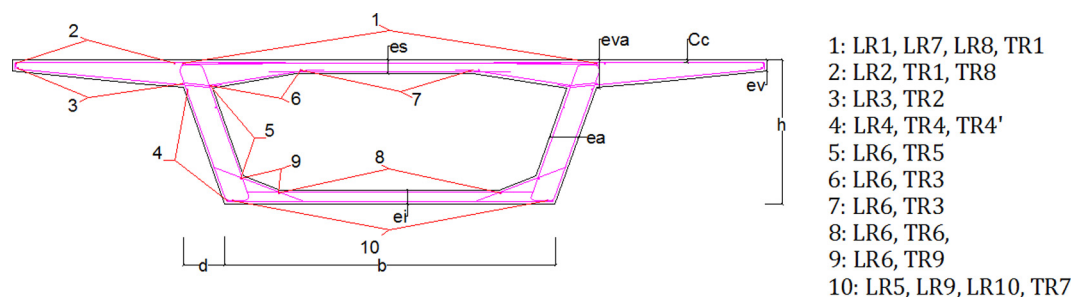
Variables regarding geometry and reinforcing steel of the PTC box-girder road bridge.
